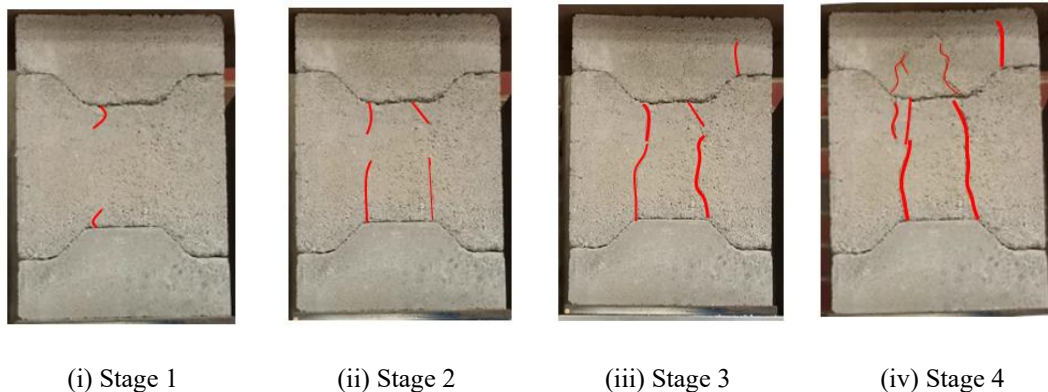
Typical damage-to-failure progress of 1-block prism: (i) tensile wing cracks initiate; (ii) cracks extend from key and propagate downwards; (iii) crack coalescence; (iv) more cracks occur near the contact region
